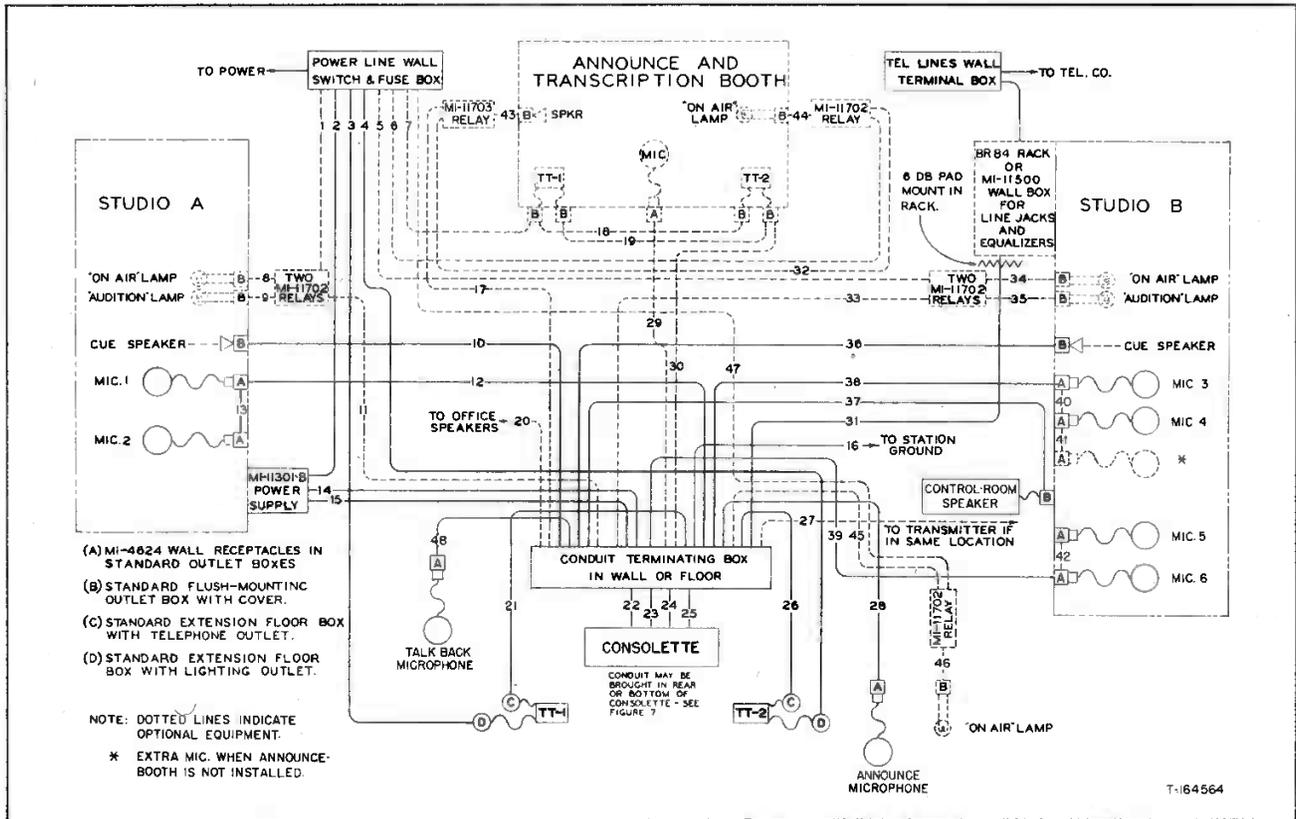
Typical Conduit Layout for Two-Studio Installation
